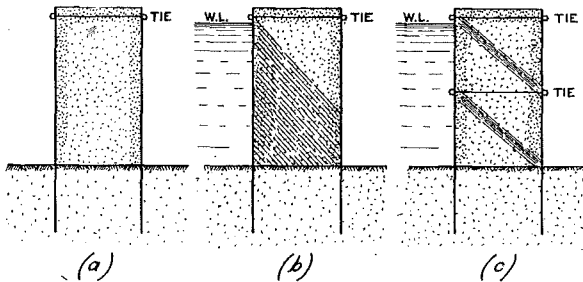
DOUBLE SHEET-PILED WALL COFFERDAM.
